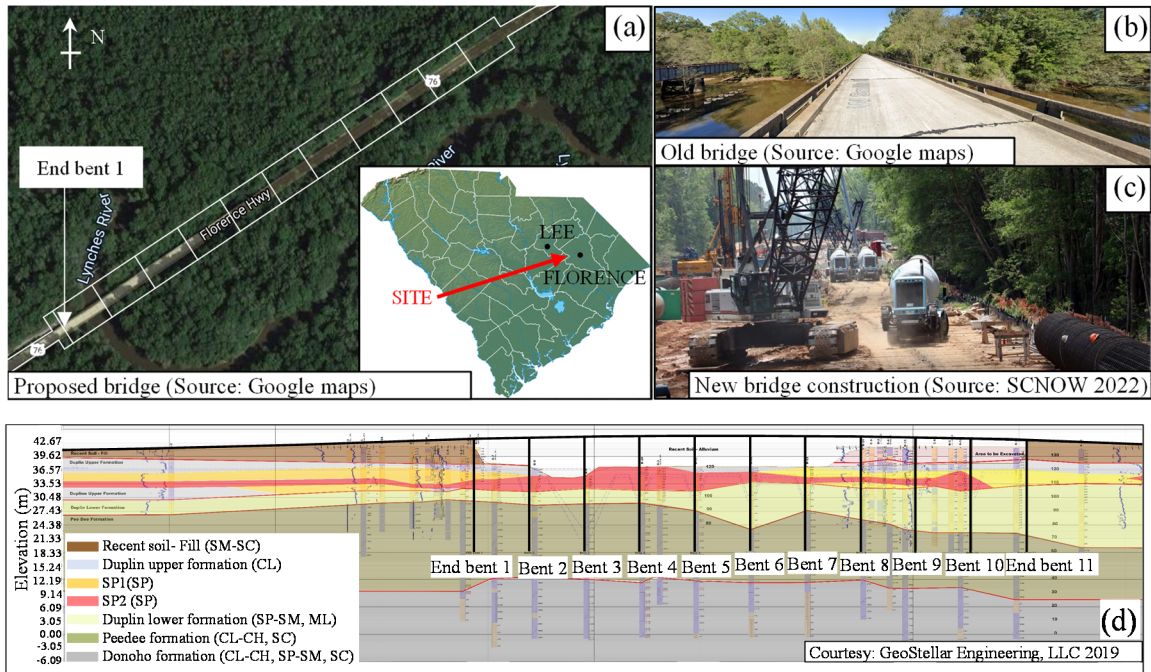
(a) Proposed location of the new bridge, (b) old bridge, (c) new bridge under construction, and (d) soil profile and the new bridge elevation
